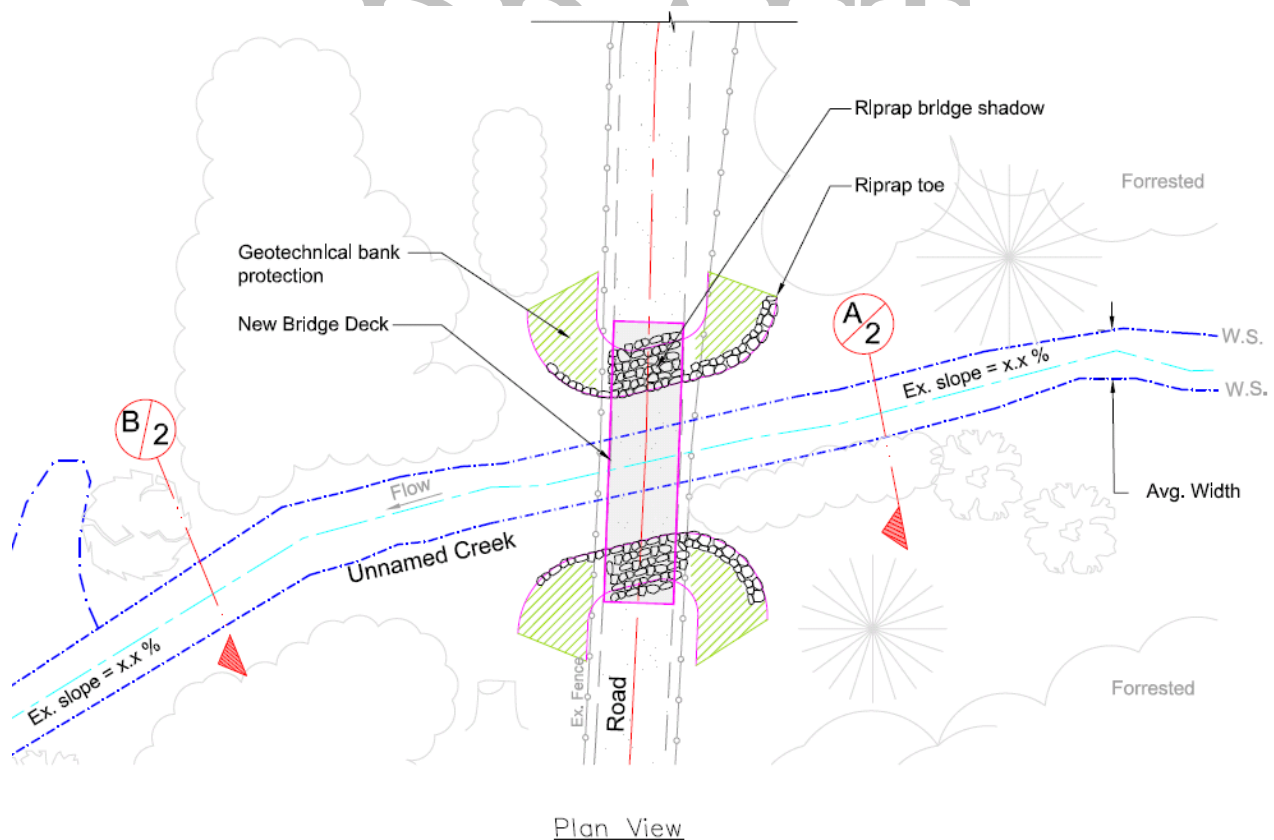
A plan view of a bridge showing reinforcements to the road embankment.
